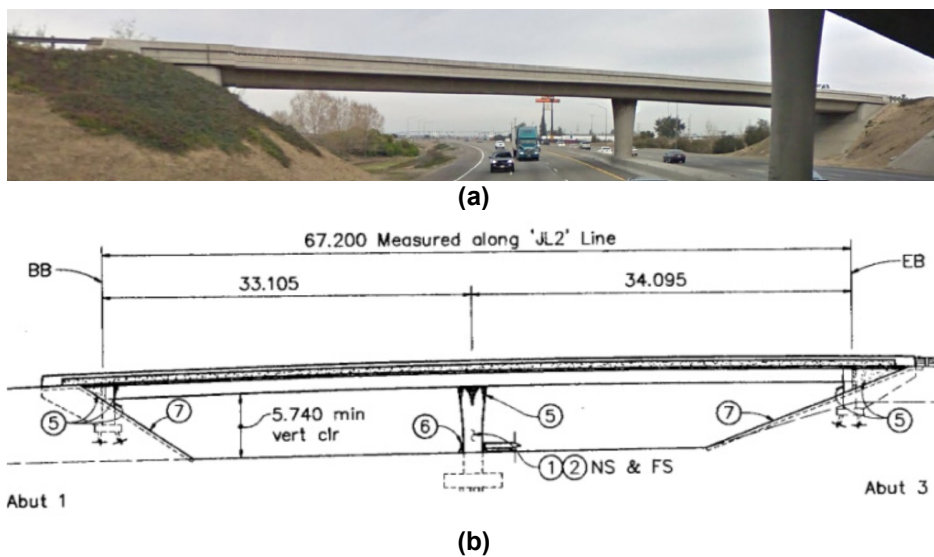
The Jack Tone Road On-Ramp Overcrossing: (a) picture (source: Google Maps); (b) elevation (source: Caltrans structural drawings).
